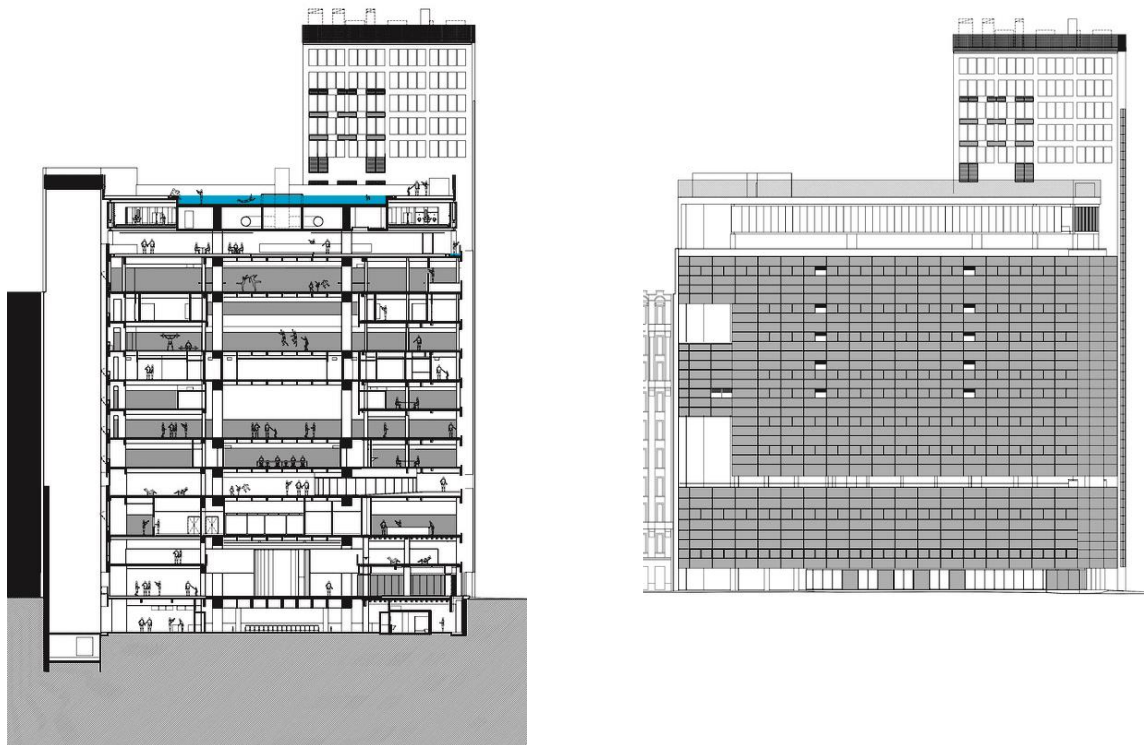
(left) Section A (Archdaily, 2018) Figure 5.2.8 (right) General building elevation (Archdaily, 2018).
